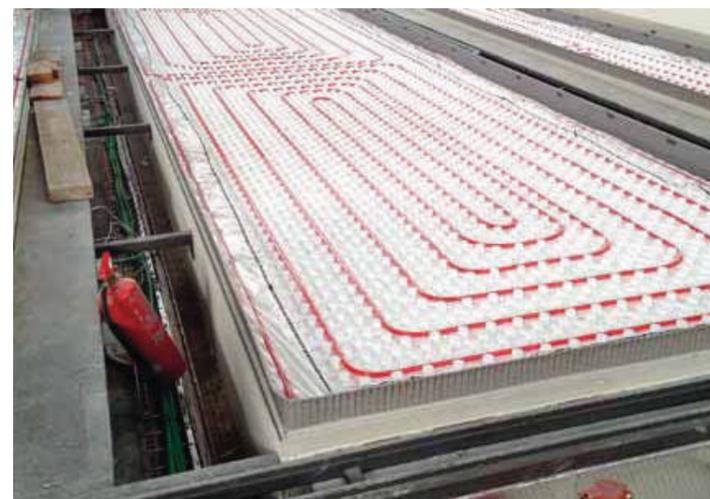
Installation of the new elevator, and radiant floor systems.
